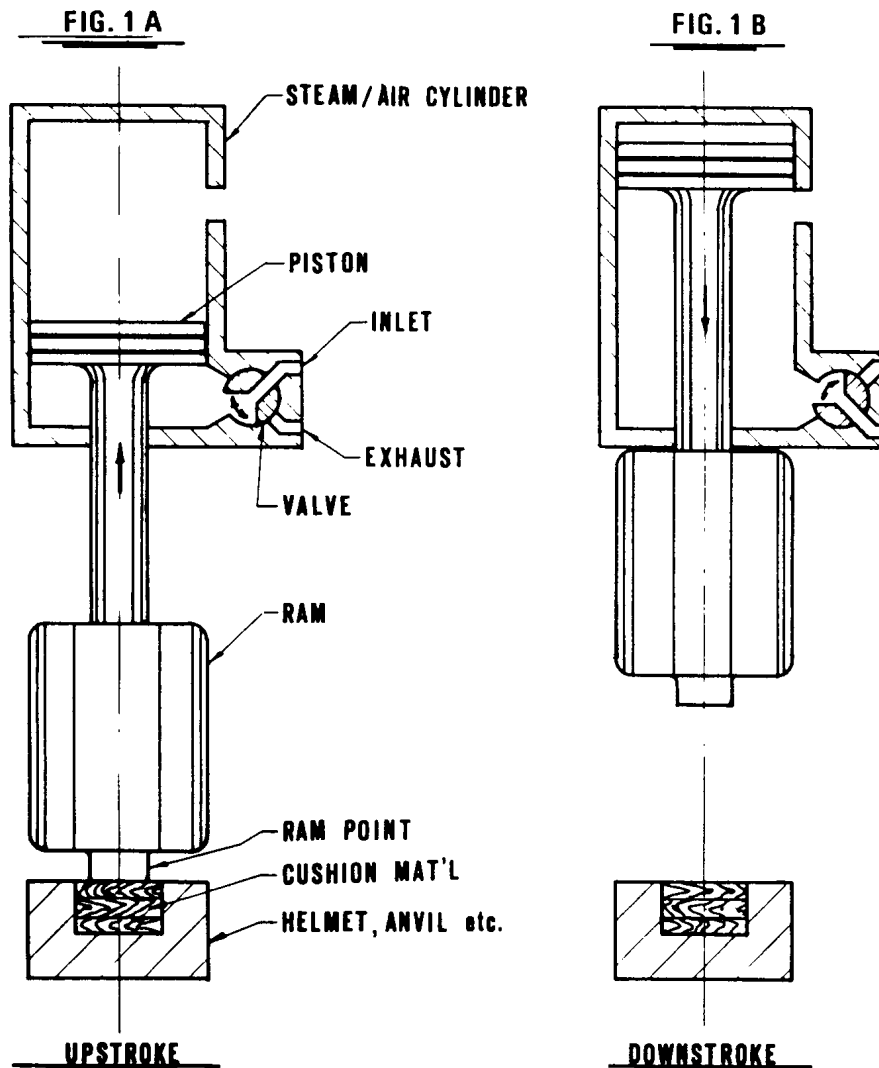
Single-acting steam/air hammer (Permission to reprint granted by Deep Foundation Institute (Item 31))
